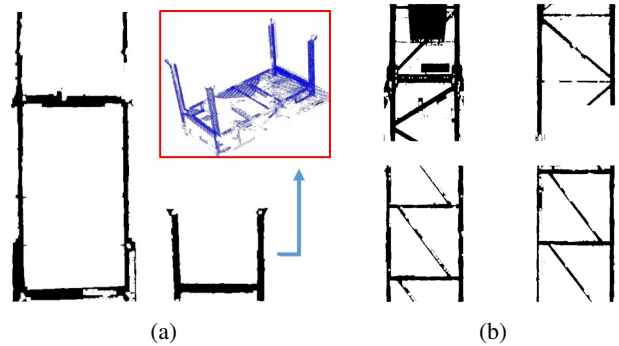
Similar objects (a) cross-sections of scaffold (left) stacking pallets (right), the latter are wrongly classified as scaffolds; (b) cross-sections of cranes (up) shoring (down), the latter have similar cross-sections as cranes.
